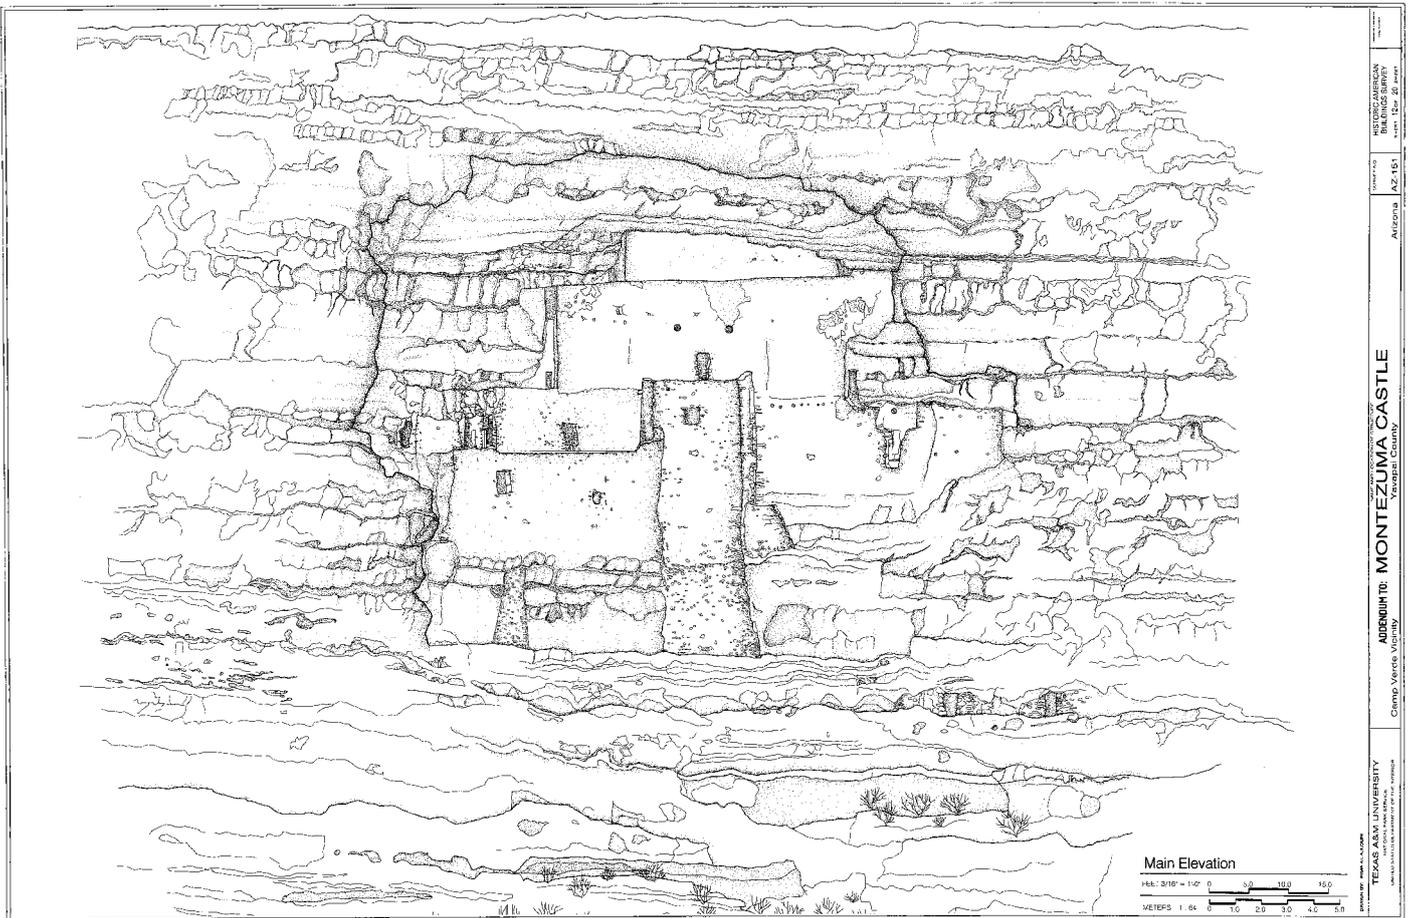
The elevation drawing of Montezuma Castle, Camp Verde, Arizona, U.S. (HABS ARIZ, 13-CAMV.V, 1- (sheet 12 of 20)).
